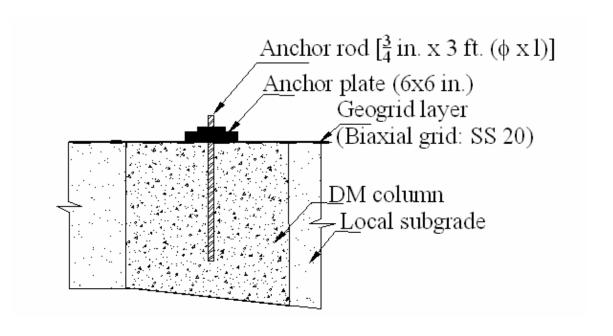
Details of Anchor Rod/Plate and Geogrid Connections to the DSM Column (Detail A)
